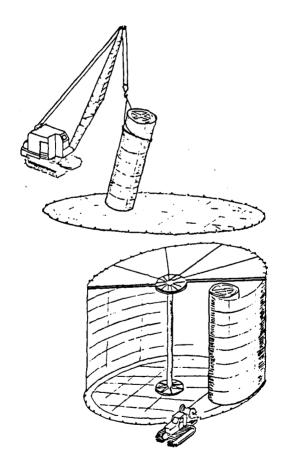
ABOVEGROUND TANK ROLL METHOD CONSTRUCTION
